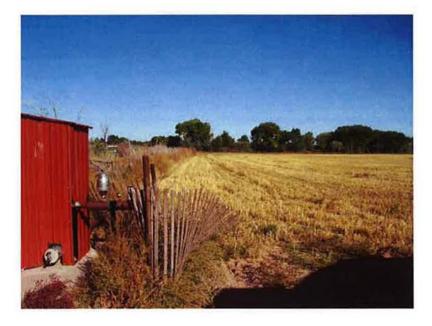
View looking easterly at proposed piping alignment that parallels the northern edge of this planted wheat field.
